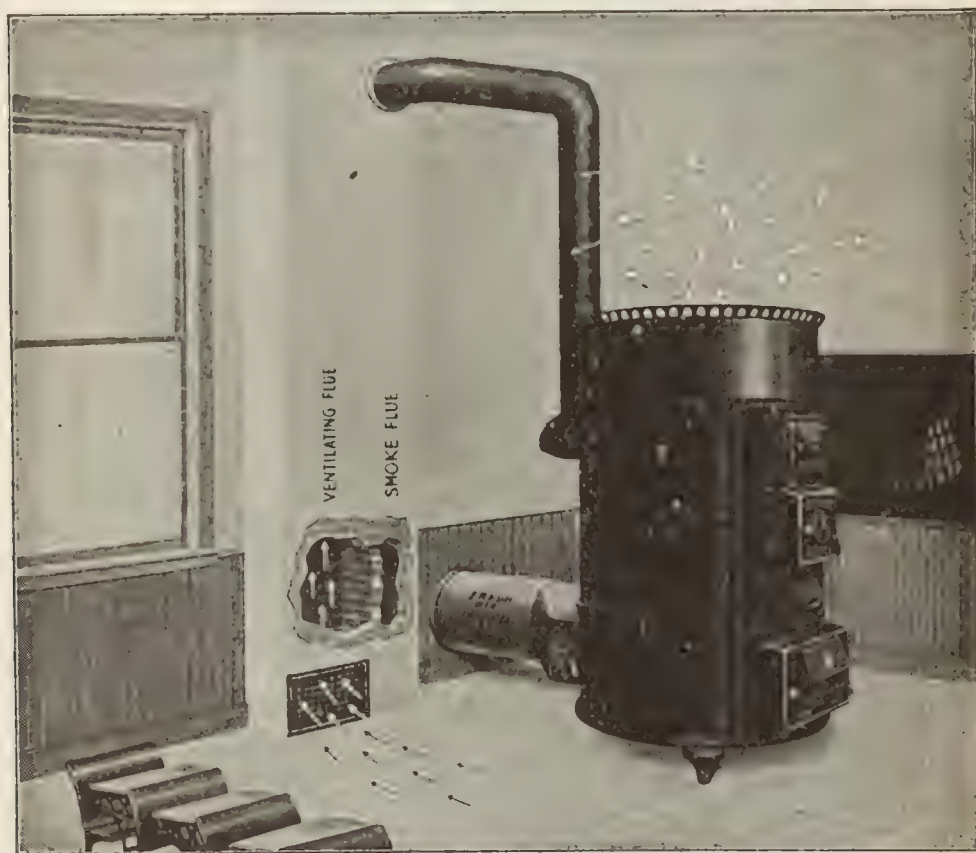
,400.—Favorite warm air heater; school room heating and ventilating system A.
